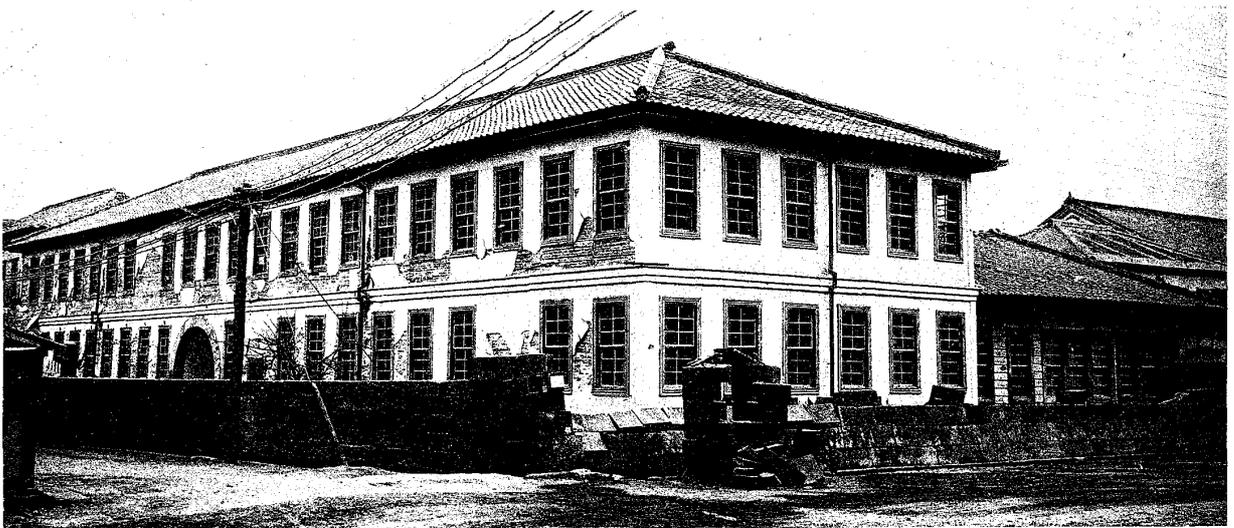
Part of the Prefectural Buildings: The plasters on the E. and W. longer sides were much cracked and shaken down. The N. fence stone wall was partially overthrown.
